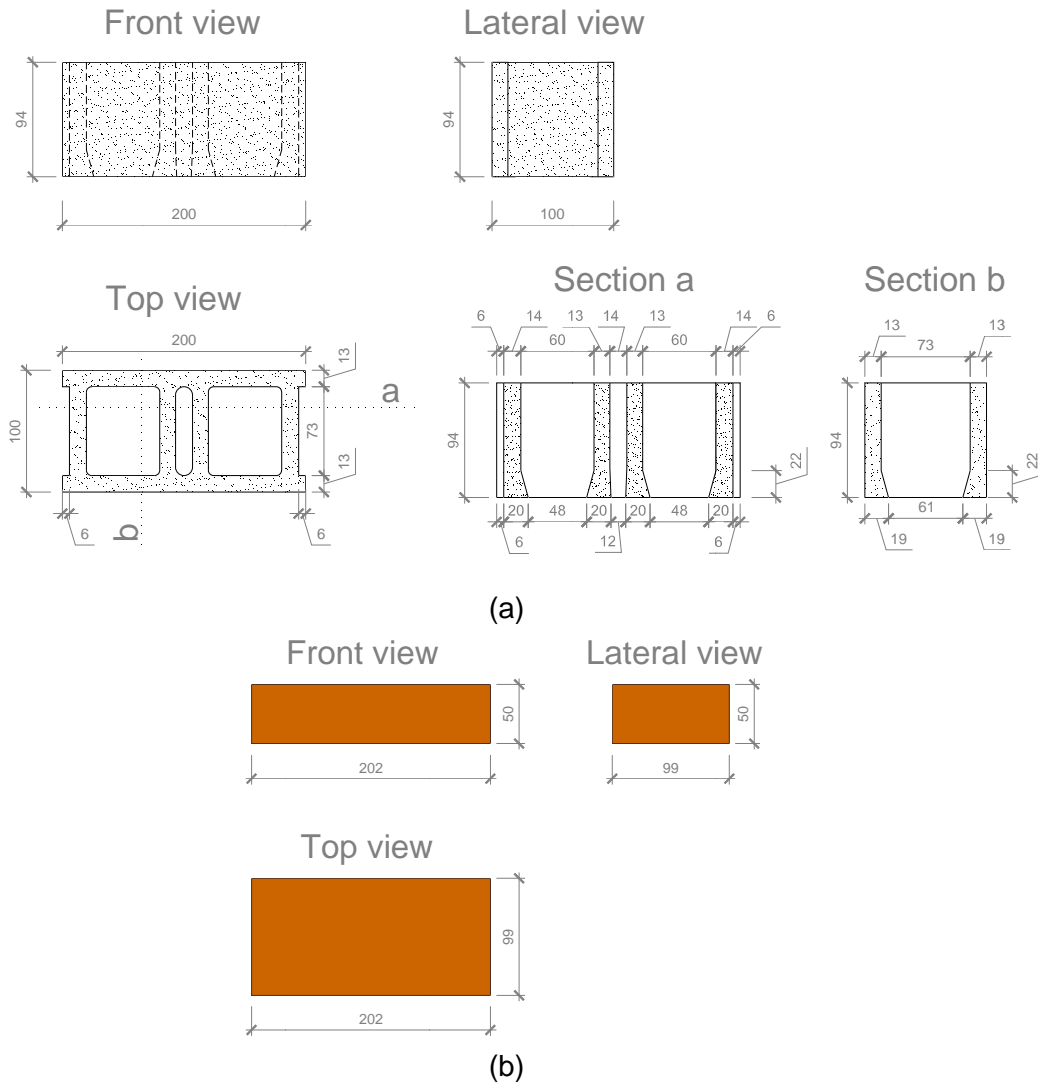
Geometry of the masonry units (dimensions in mm): a) concrete hollow blocks; and b) ceramic bricks
